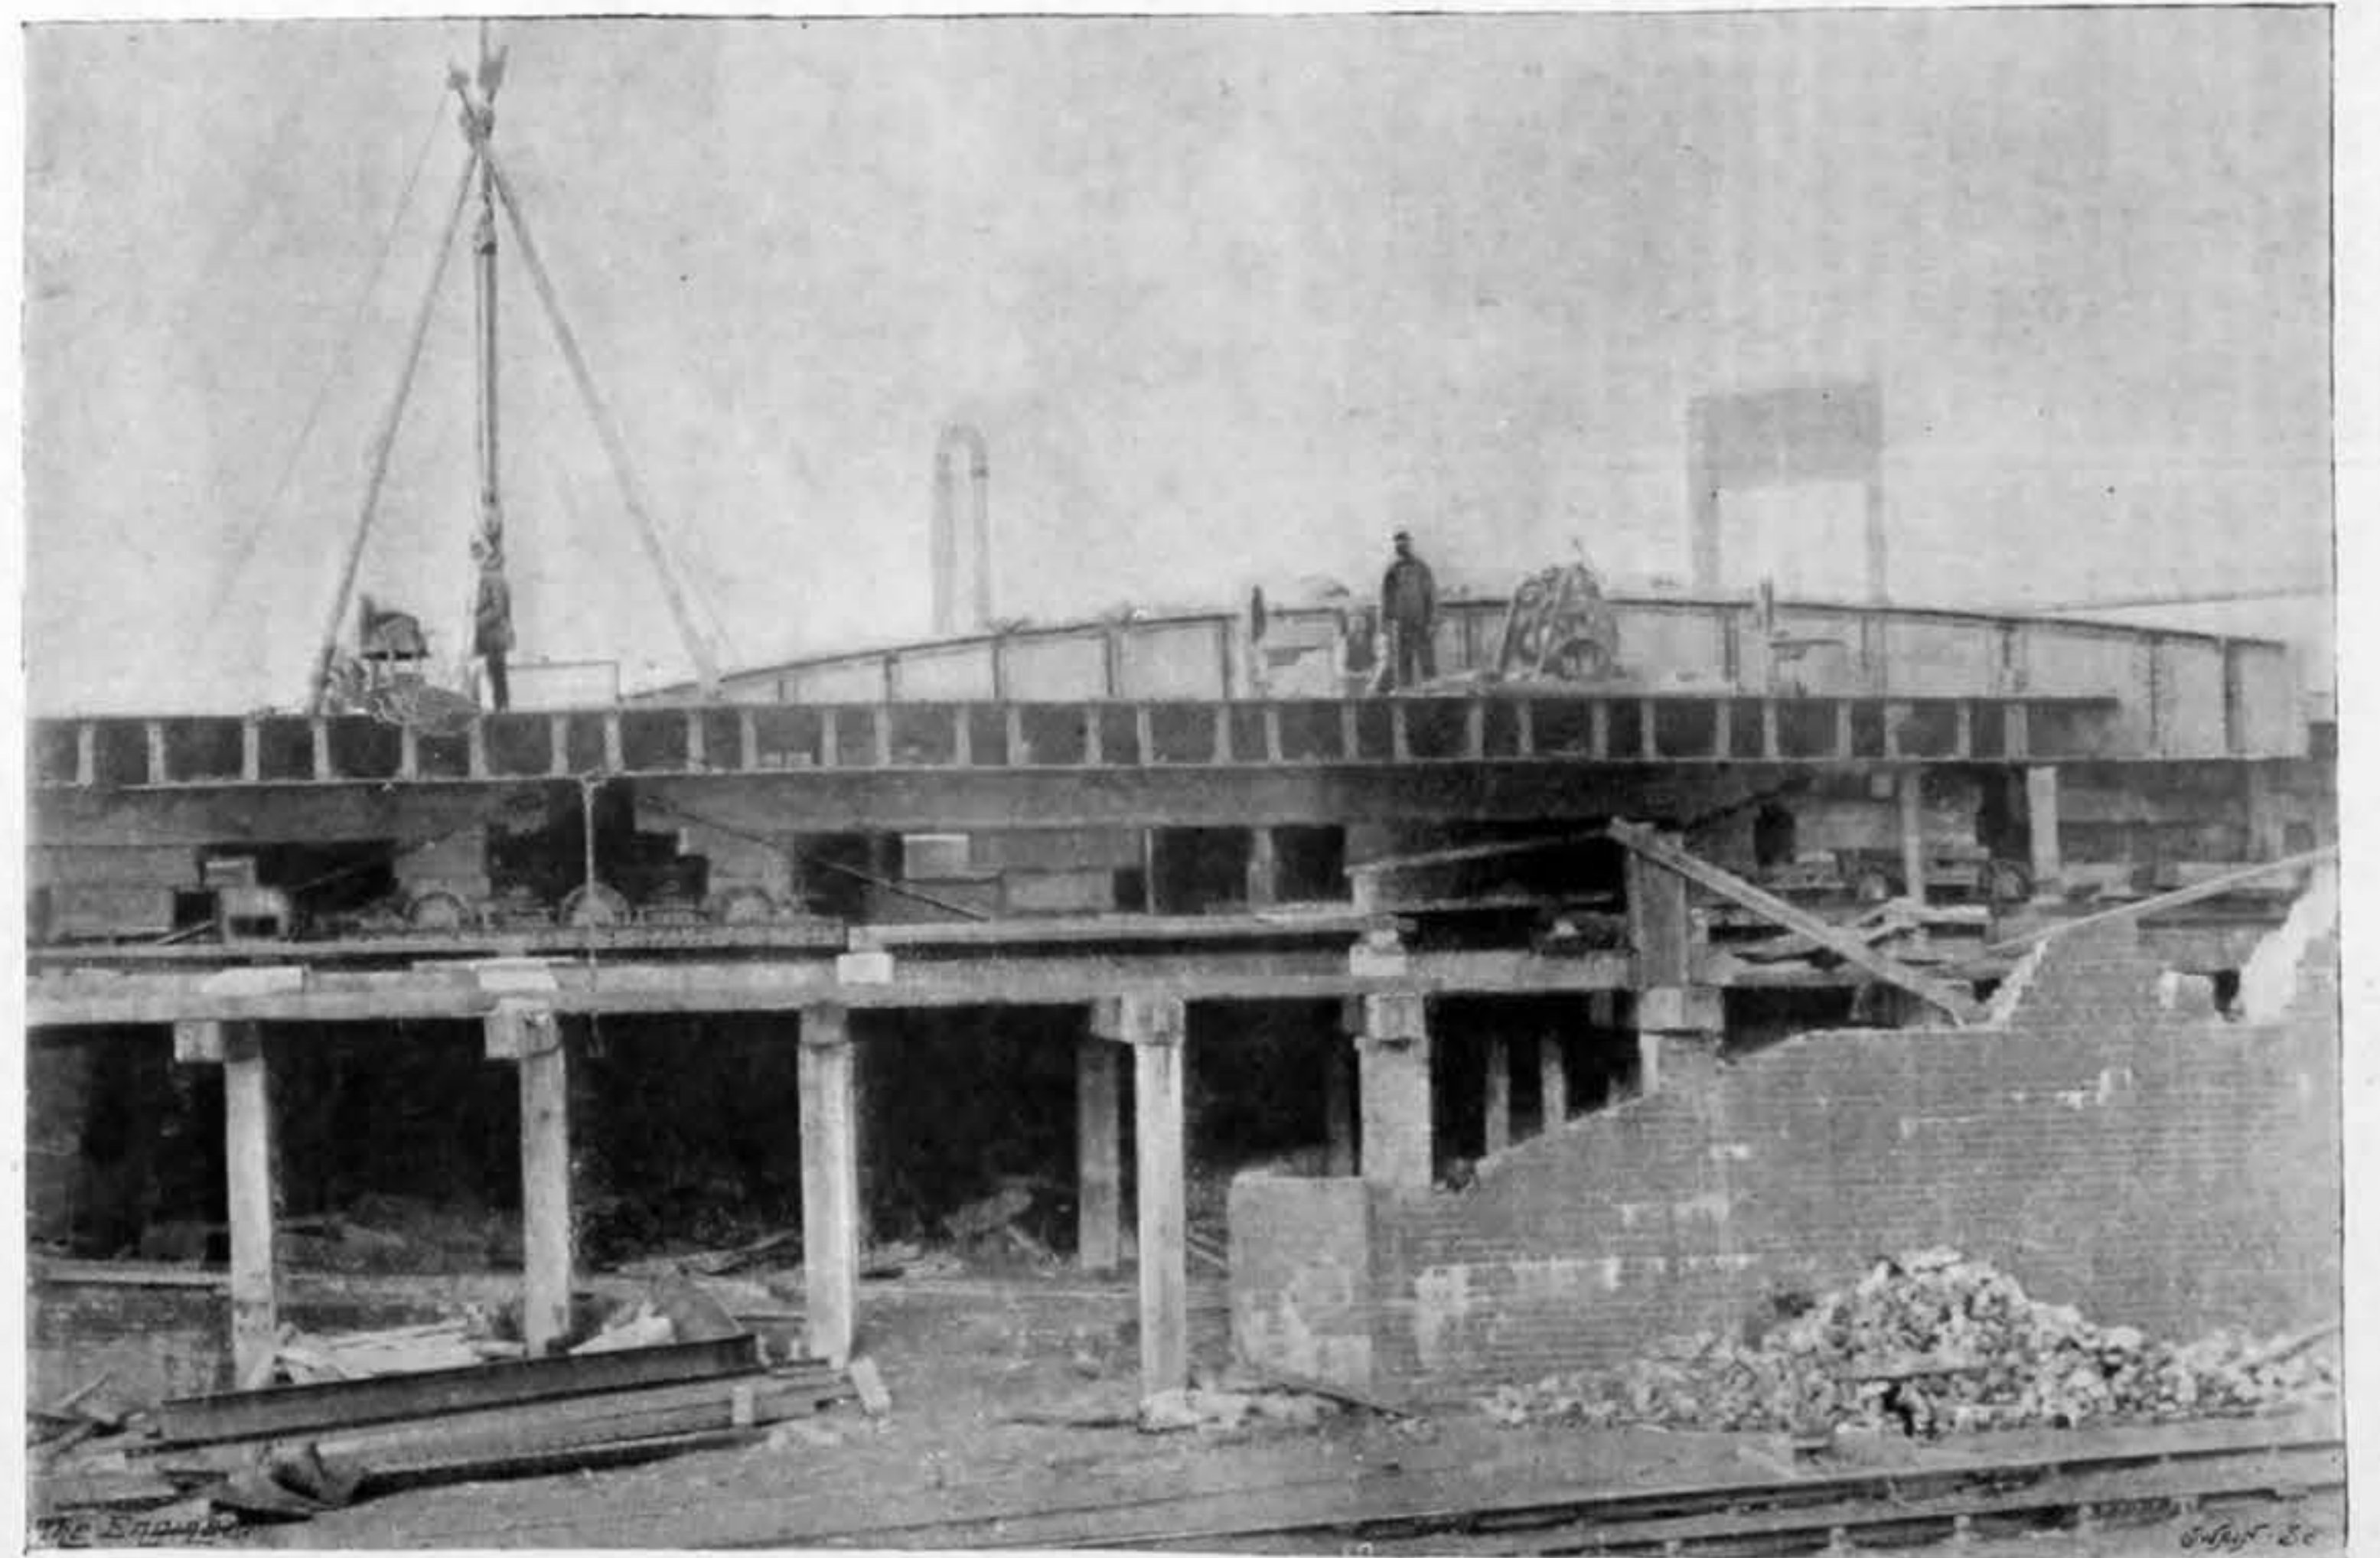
PART VIEW OF GANTRY AND SECTION OF FLOORING
